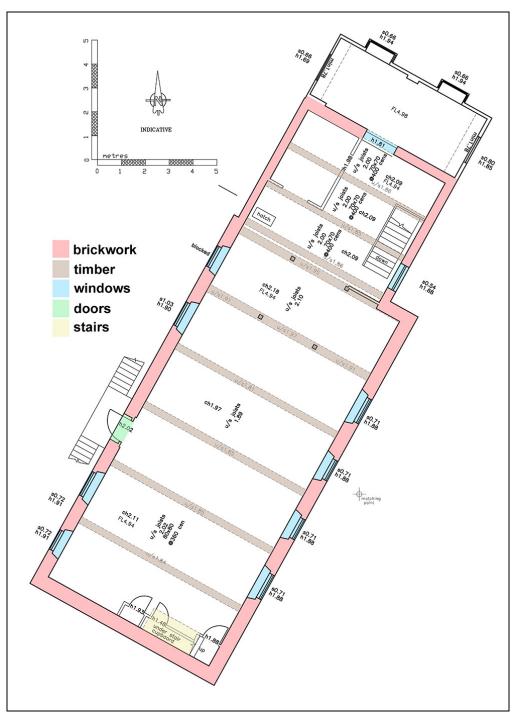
First floor plan of Ashlett Mill showing original features (the stairs are uncertain)
